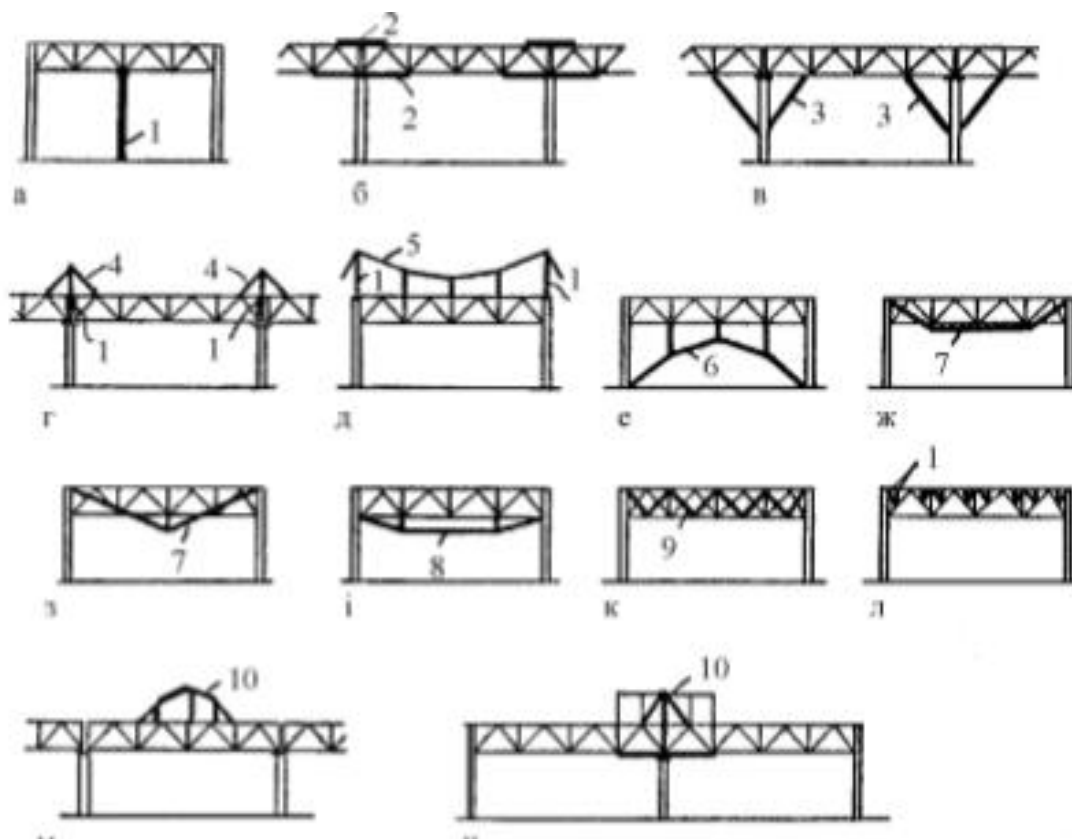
Reinforcement of rafter trusses by changing the structural scheme: a-n - reinforcement scheme; 1 - additional support; 2 - details of strengthening of basic knots; 3 - brace; 4 - suspension brackets; 5 - bearing thread; 6 - flexible arch; 7 - sprung; 8 - tightening; 9 - additional elements of the farm; 10 – lantern
